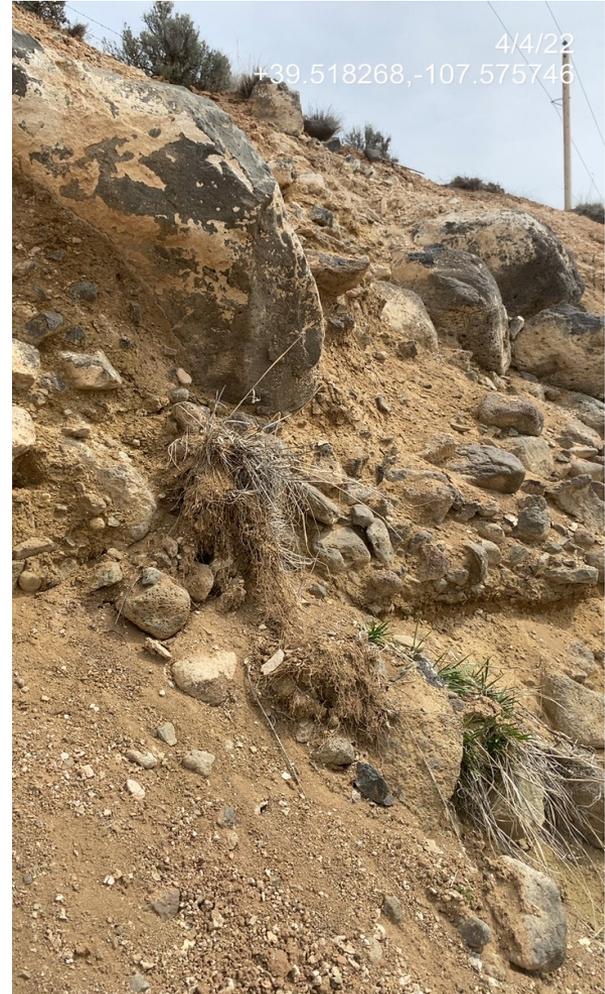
Photo taken from the center of the cut slope shows pedestalling and exposed roots on perennial vegetation colonizing the slope.
